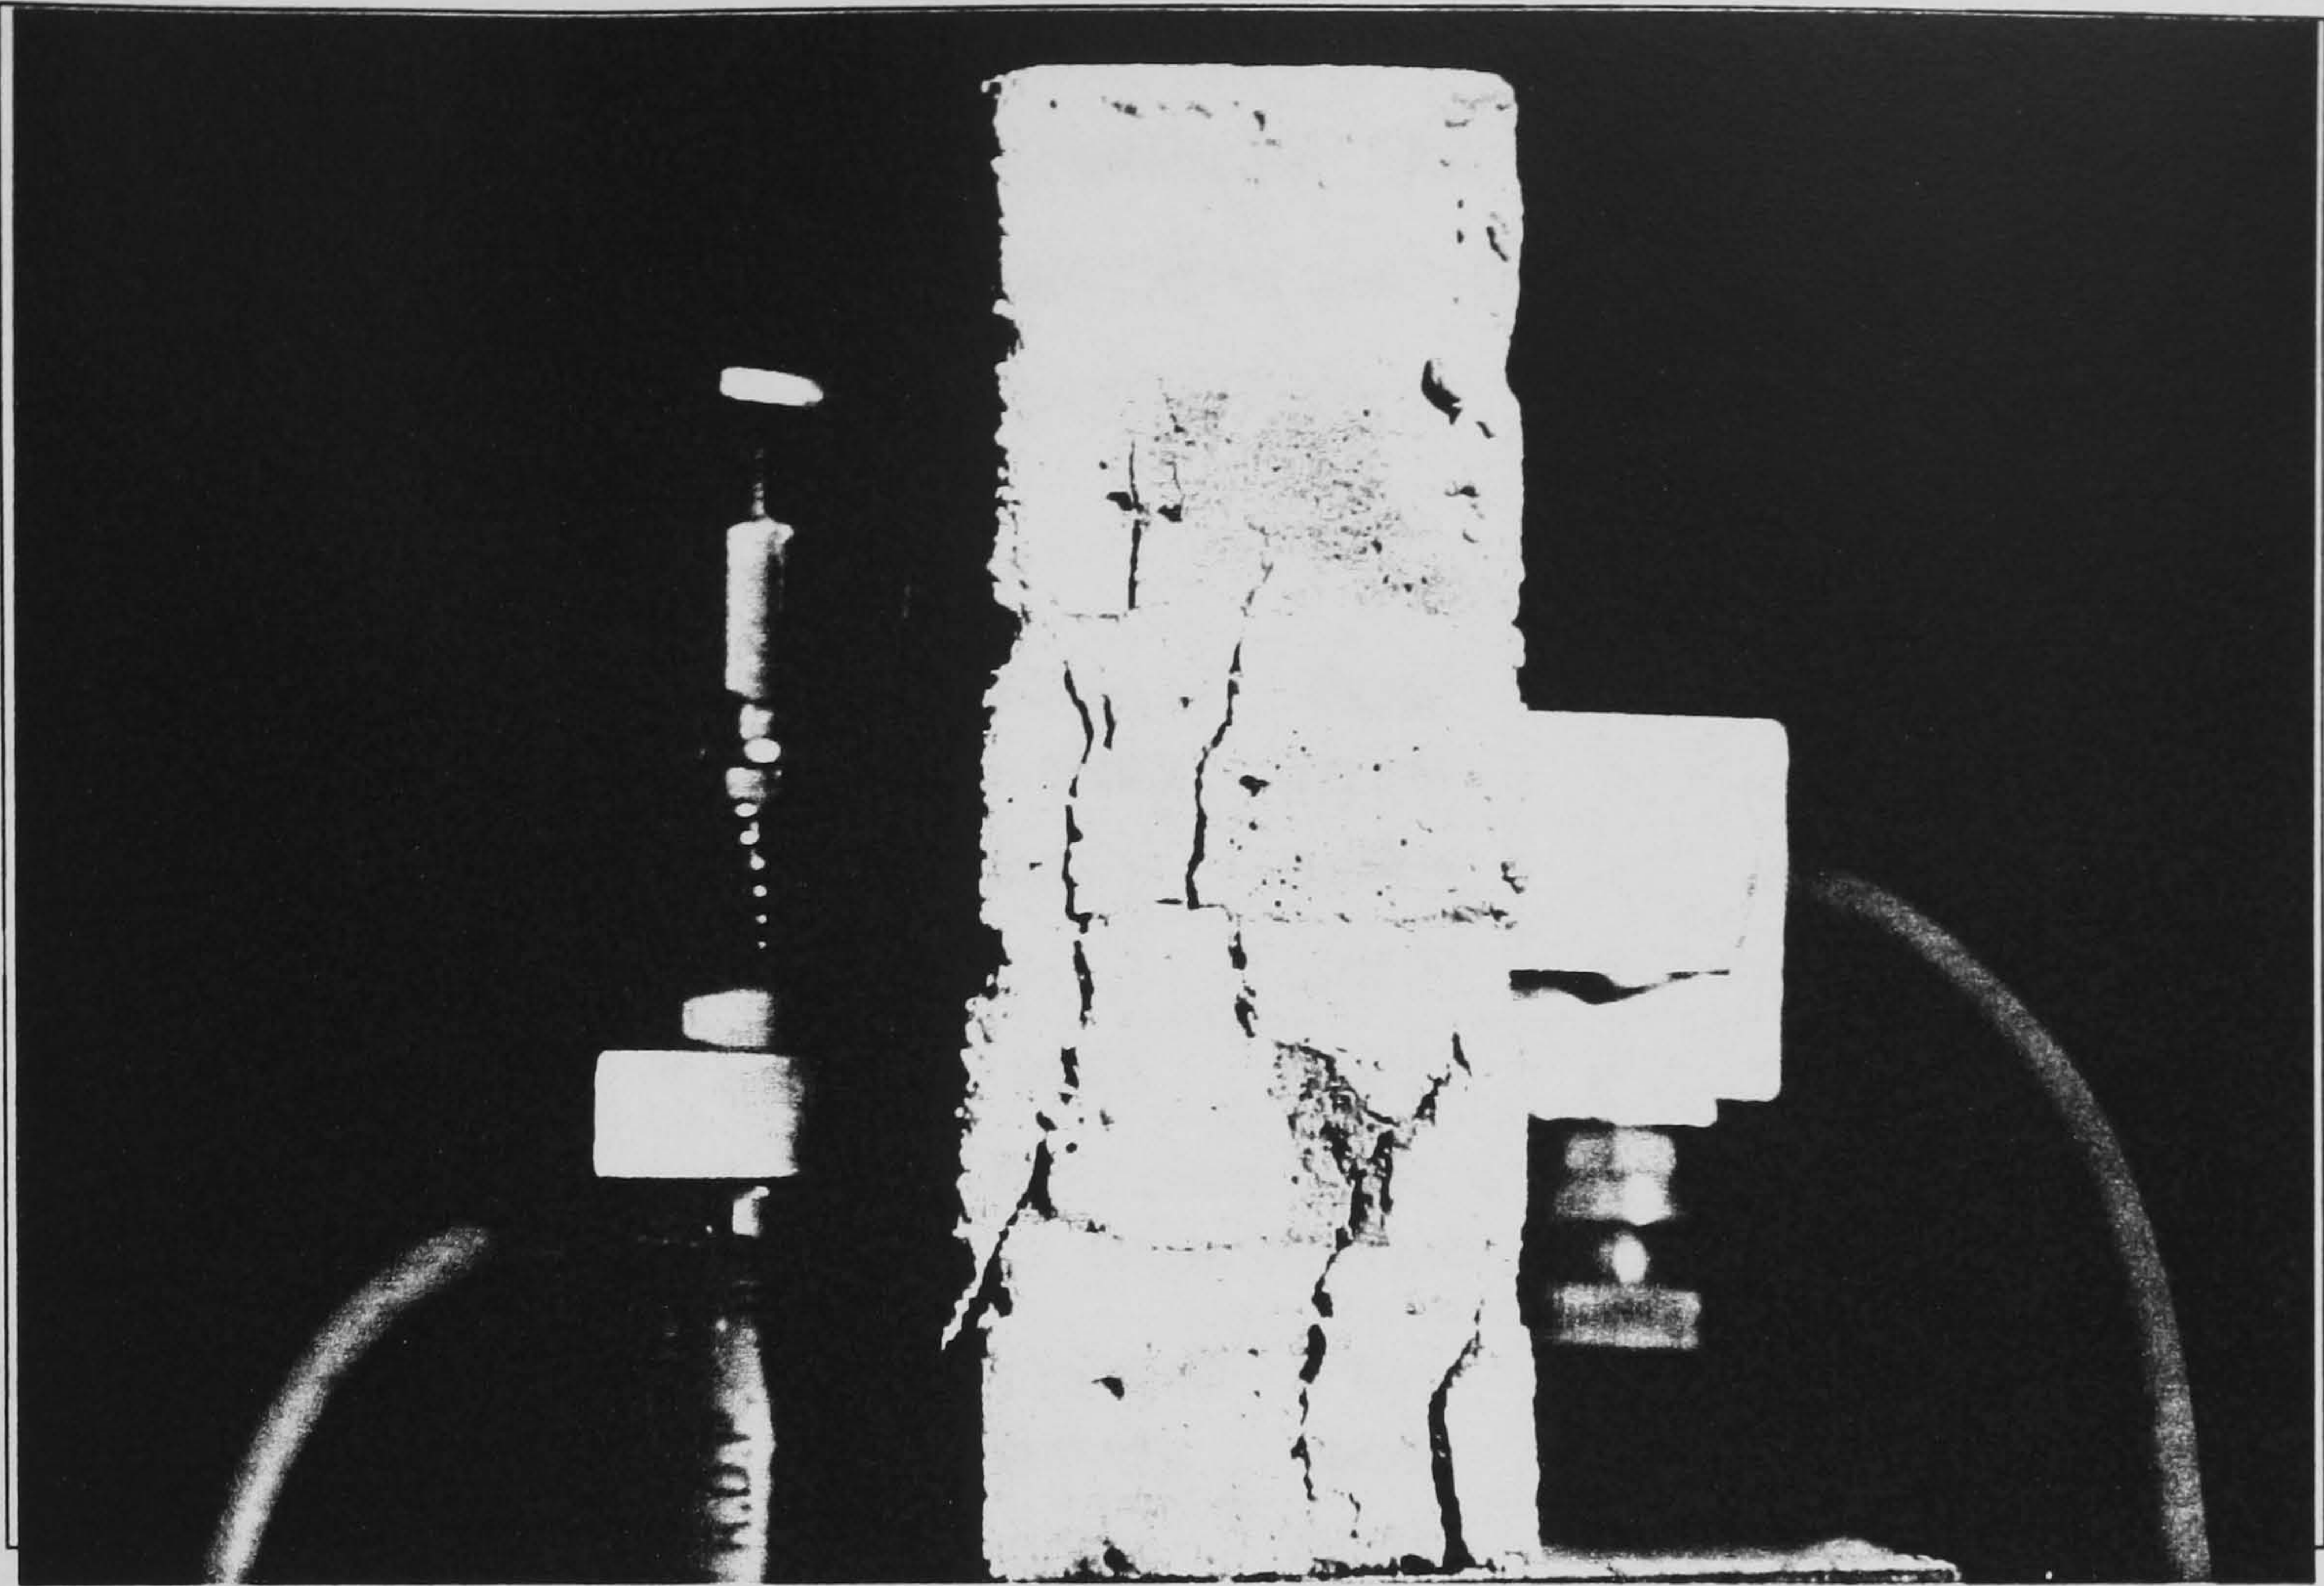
Close-up of vertical splitting failure mode for model prism
